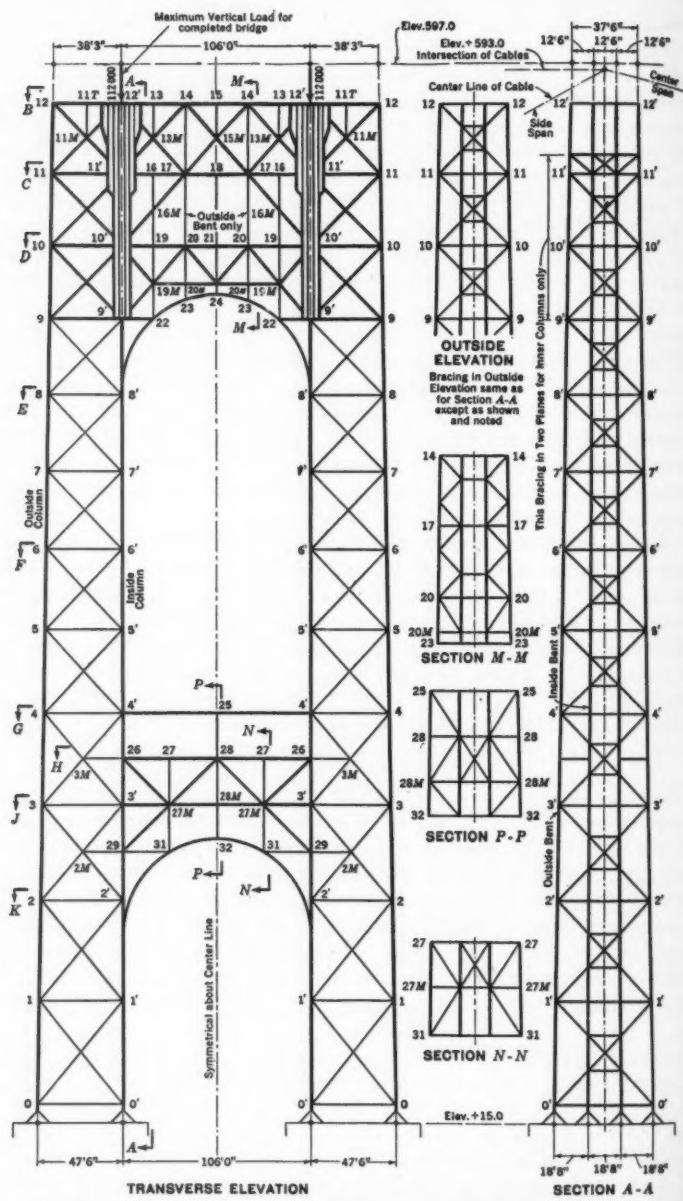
TRANSVERSE AND END ELEVATIONS OF TOWER (SEE, ALSO, FIG. 15).
